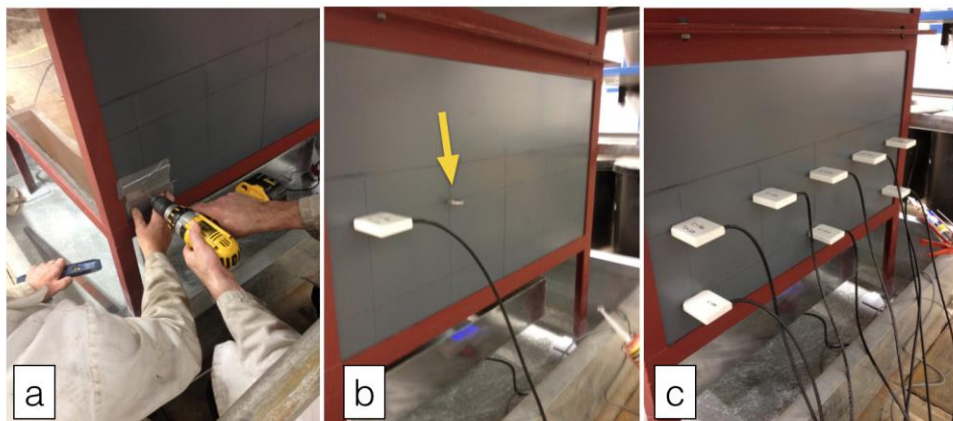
Installation process, showing the two probe depths. (a) Layout of the probes location and making two holes for each probe; (b) Insert tool which was used to create path for probe; (c) illustrating the 8 probe locations.
